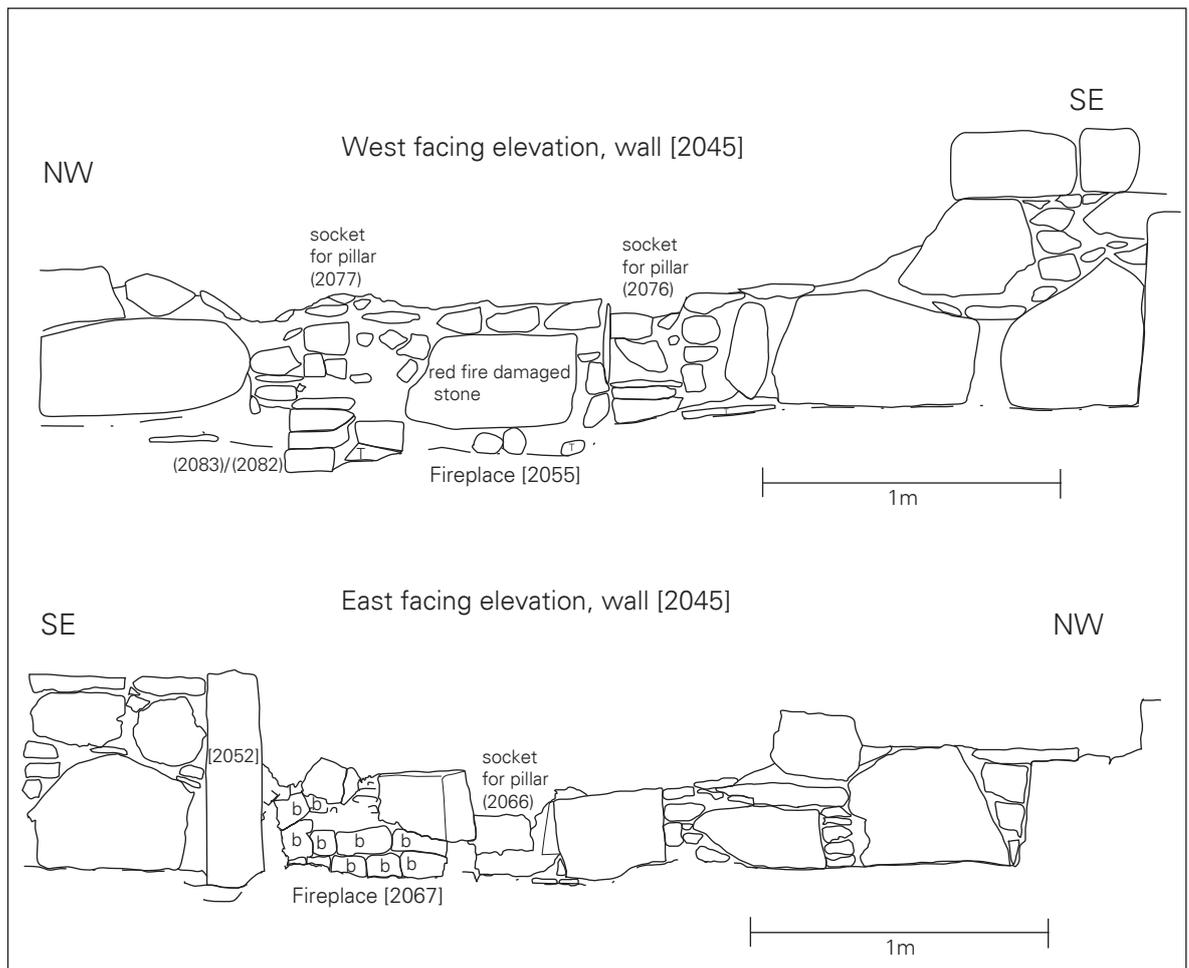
West facing and east facing elevations of wall [2045] and hearths [2055], [2067], Trench 4b.
